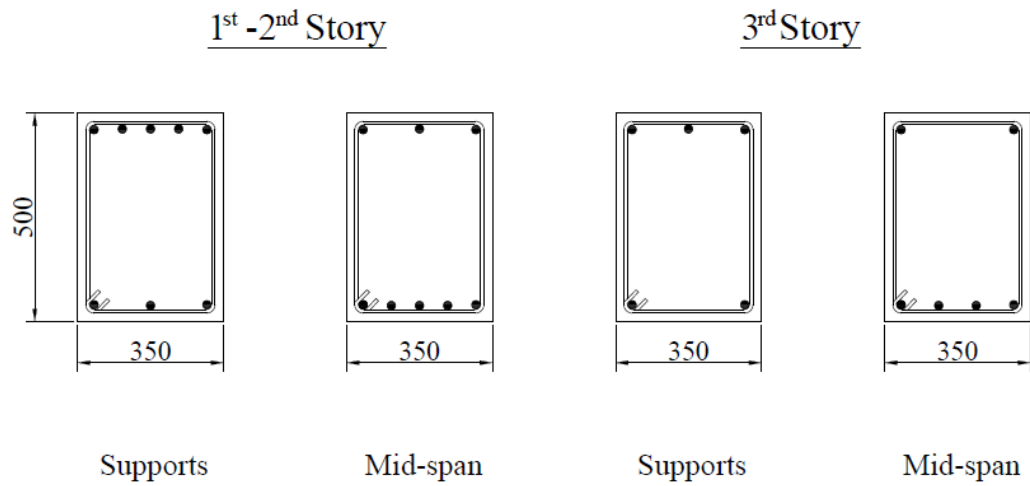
Cross Sections for Beams of 3 Story Irregular Frame
